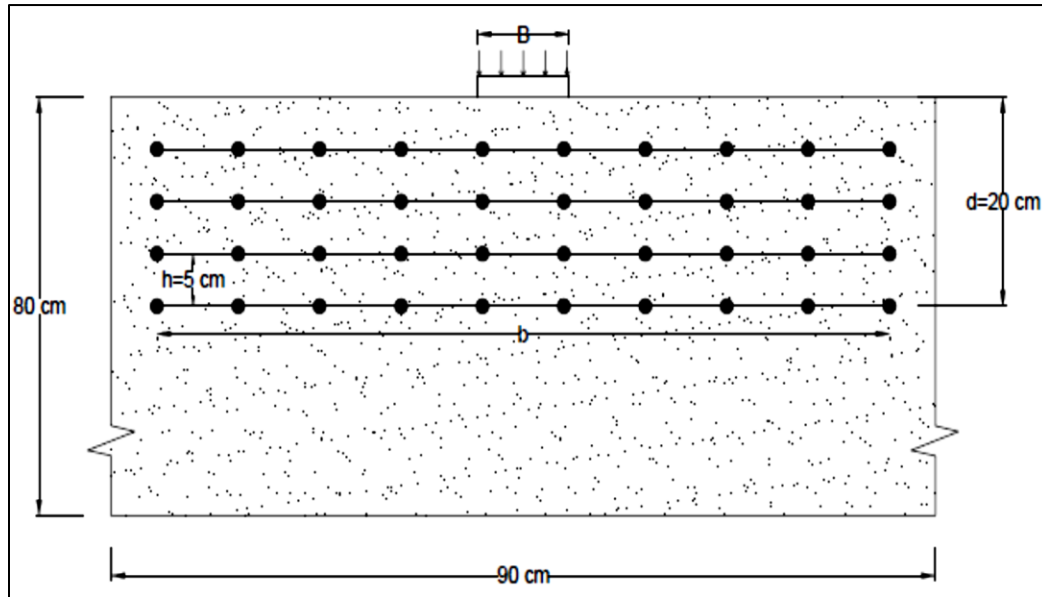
Sectional Elevation of geogrids placed on weak foundation bed
